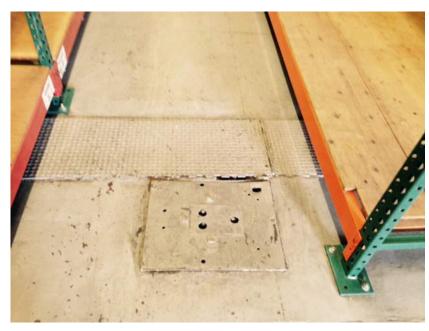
Subject Site (Facing Northeast) 3820 Penniman Avenue Interior Storage Warehouse - Sump
